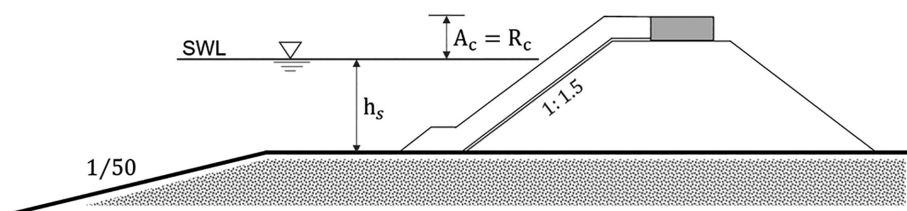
Cross section of model structure with armoured slope (Lee and Kim, 2023).
